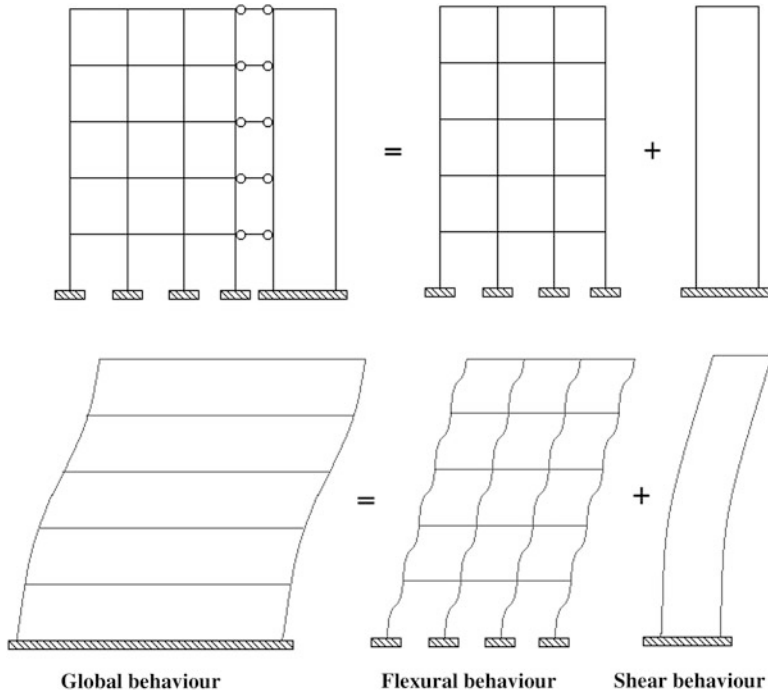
Coupled behaviour of a frame system and shear wall
